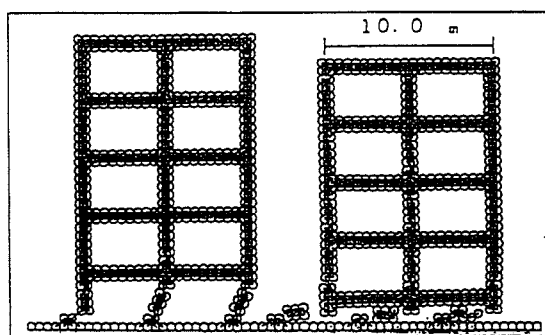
EDE simulation of the damage to the first floor collapse-type
